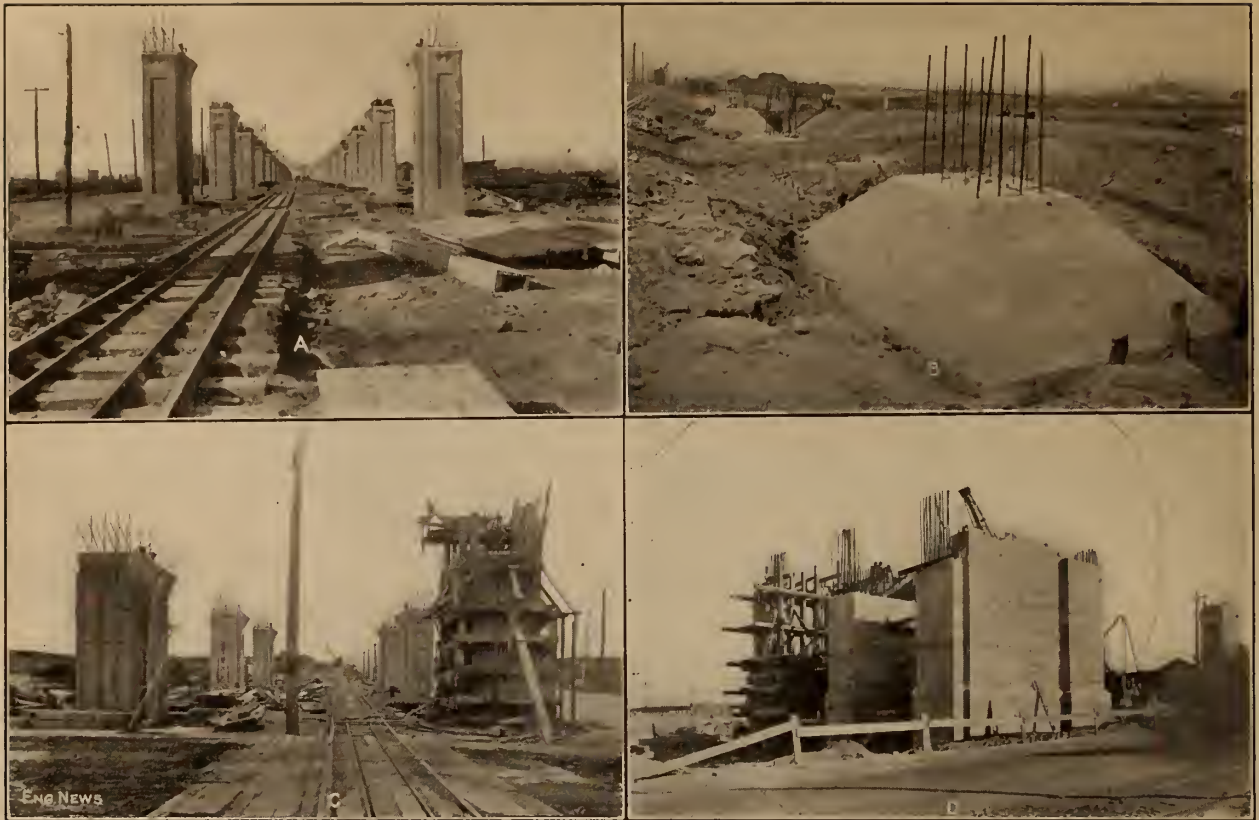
VIEWS OF QUEENS BOULEVARD REINFORCED-CONCRETE VIADUCT DURING CONSTRUCTION
